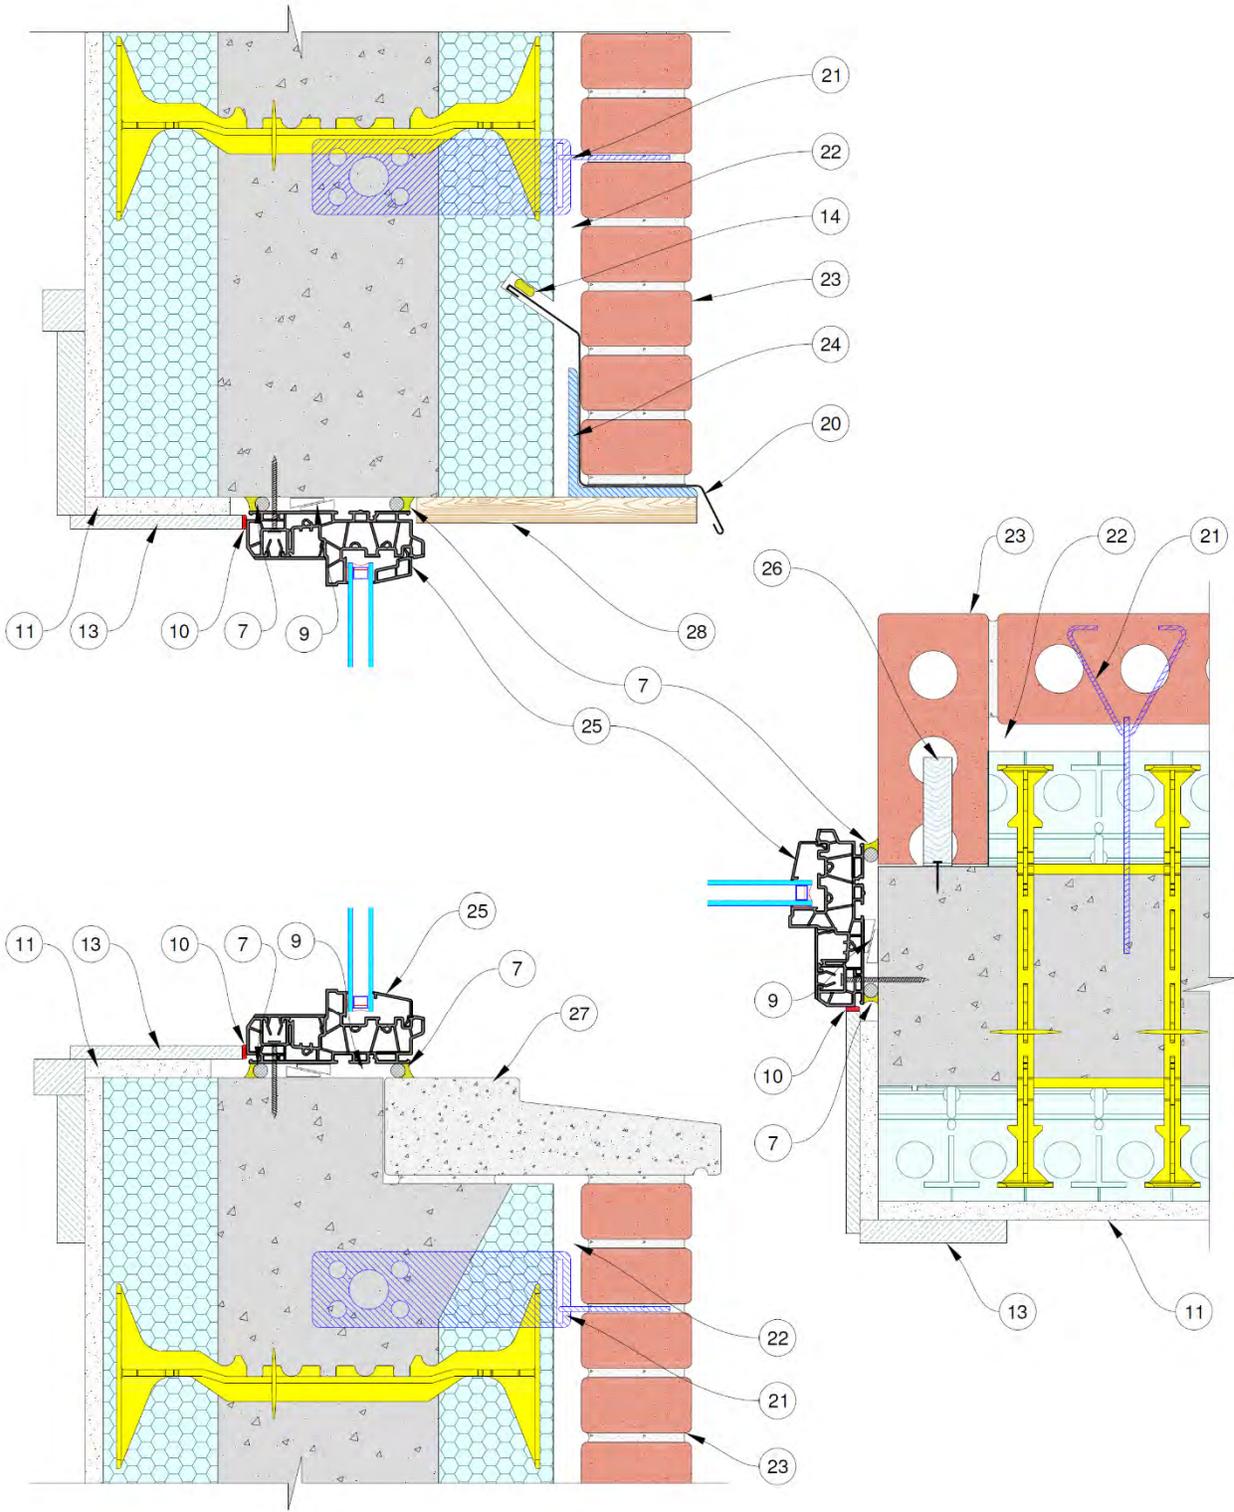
ICF Window Assembly - Direct to concrete, Boxed window centered, Brick veneer
